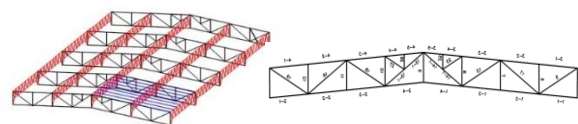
General layout of the roof structure and main truss. Purlins (blue); Bracing truss (red); Main truss (black)
